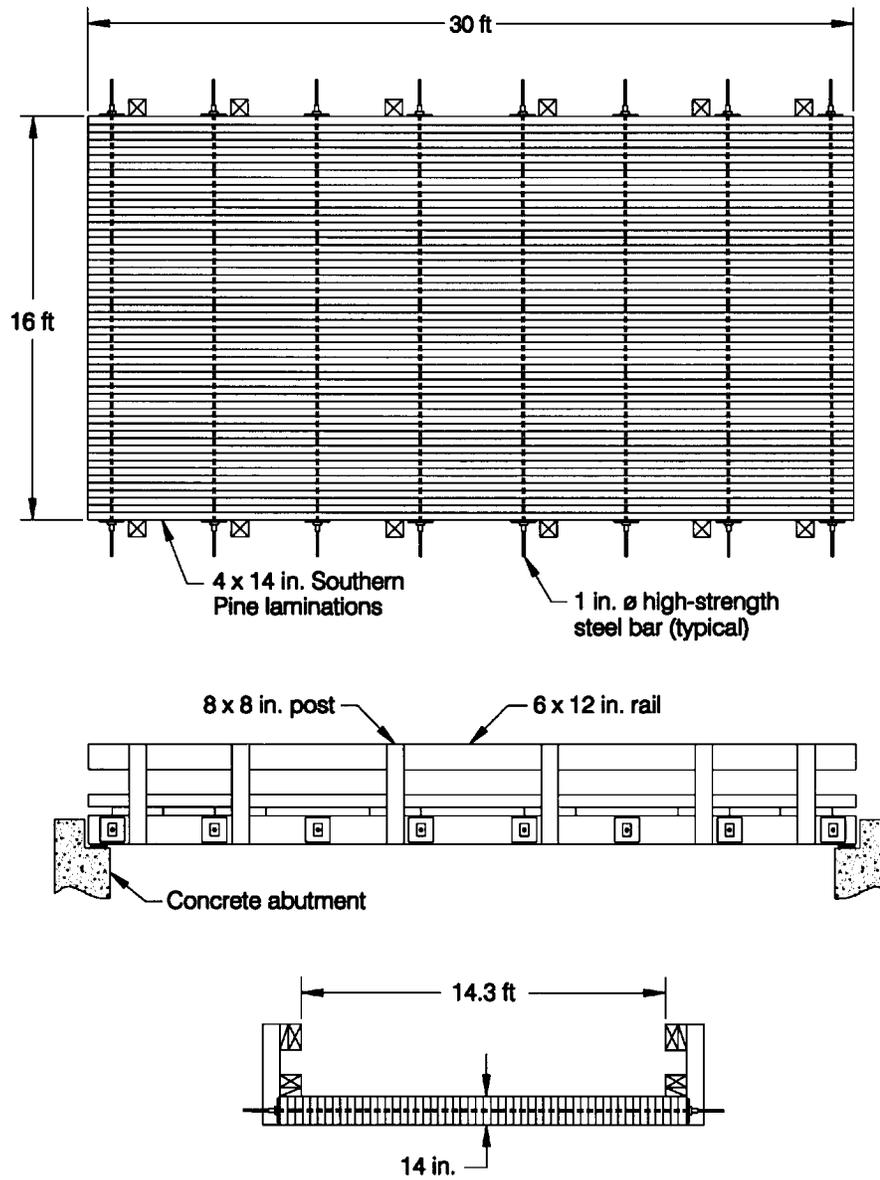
Design configuration of the Lynchess Woods Park bridge.
